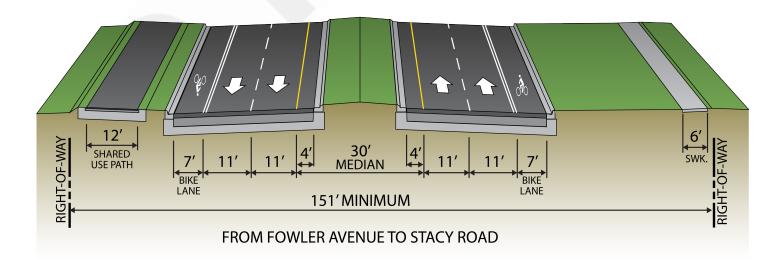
Typical Section from Fowler Ave to Stacy Rd
